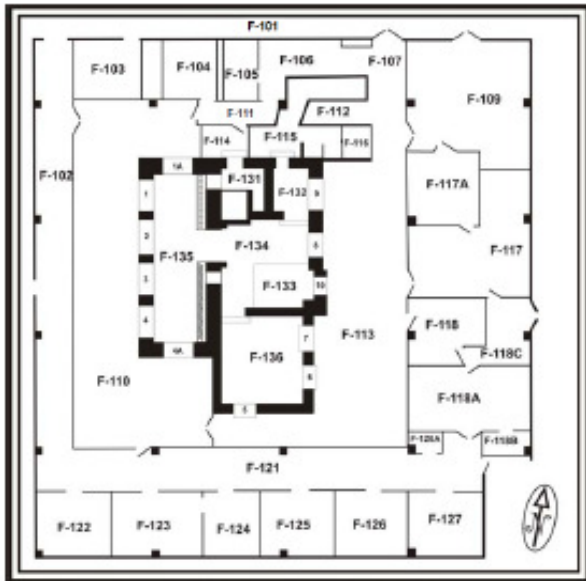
MRB, first floor – F Wing housing the FSMHF is highlighted (scale is 1:1200)
